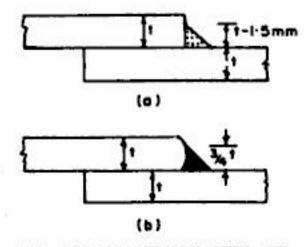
MAXIMUM SIZE OF WELD.
